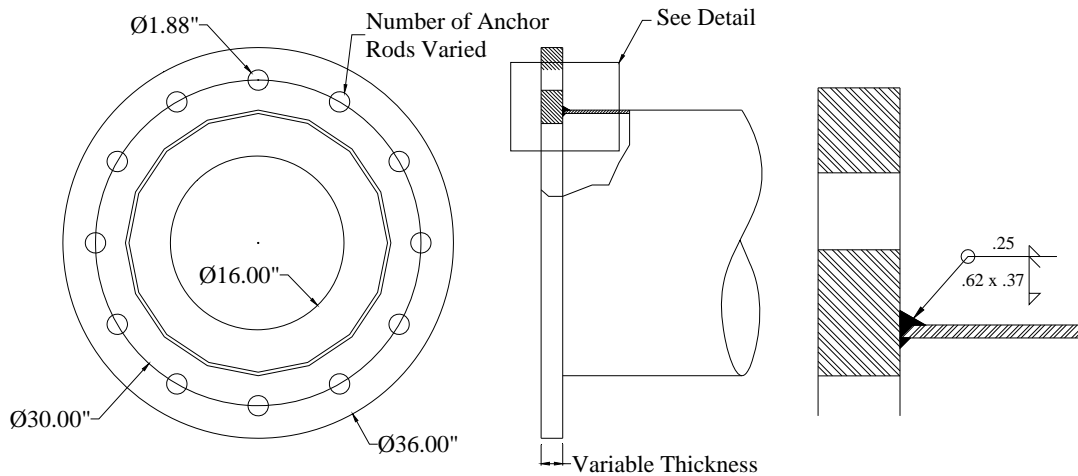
Texas Connection Detail for Anchor Rod Parametric Study
